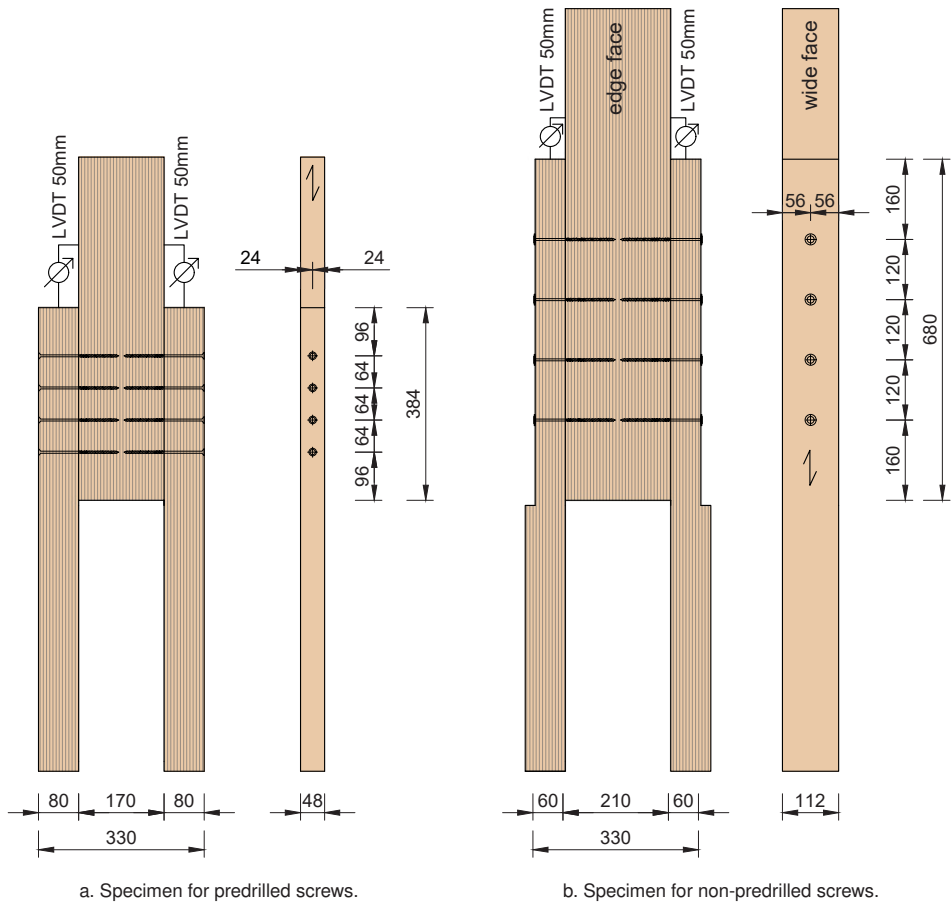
Schematic drawing of specimens for rows of screws, dimensions in mm.
